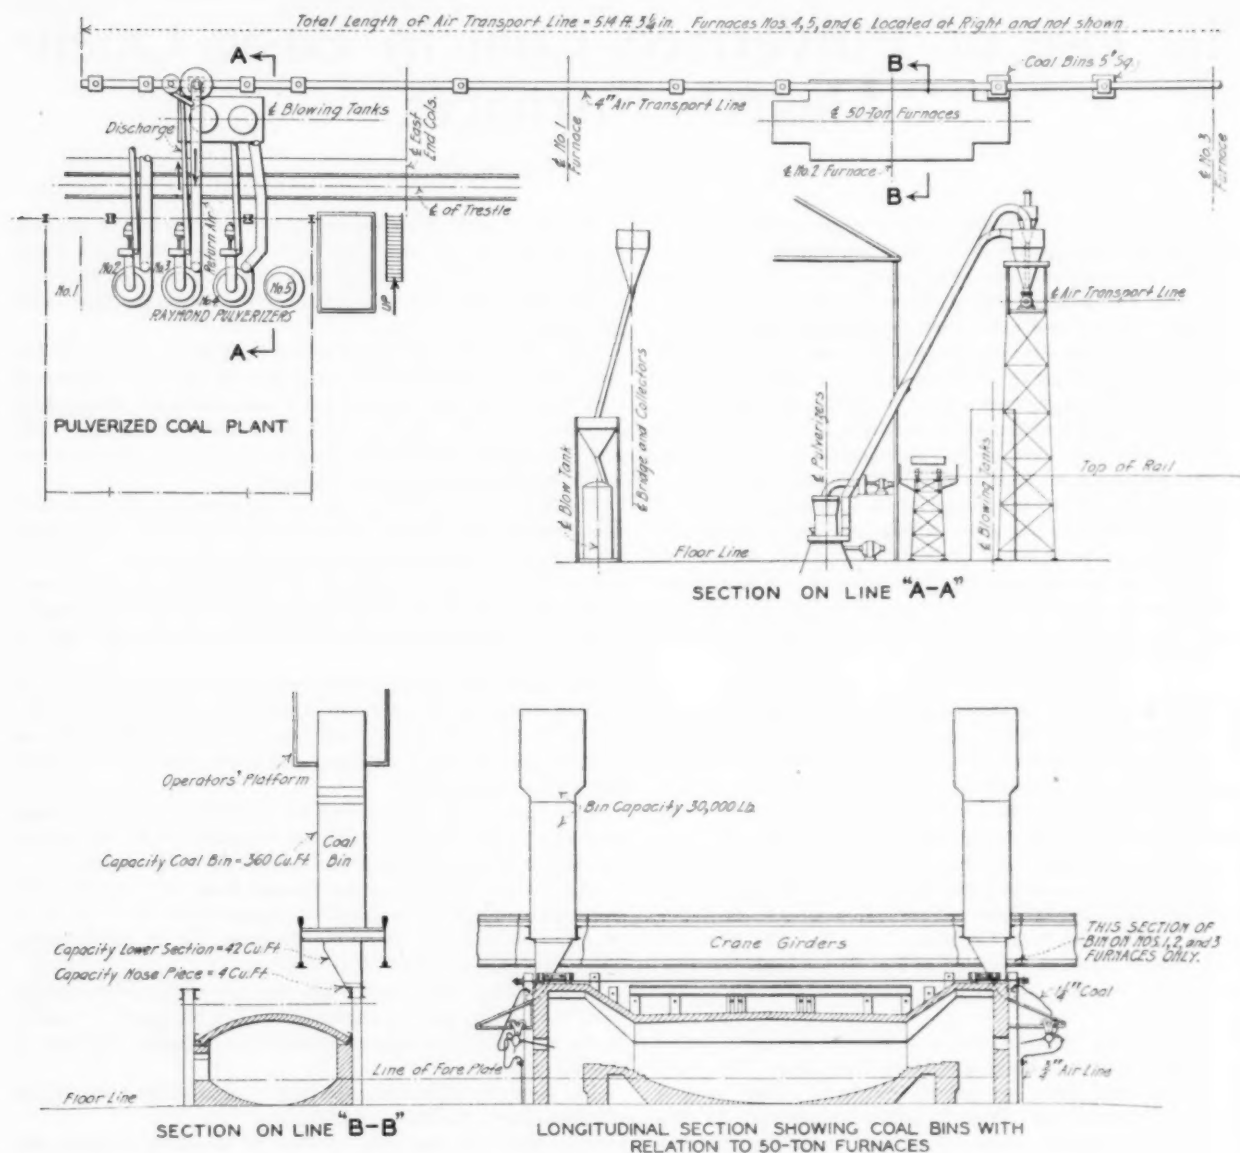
LAYOUT OF PULVERIZED-COAL PLANT AND FURNACES OF EASTERN STEEL CO.
